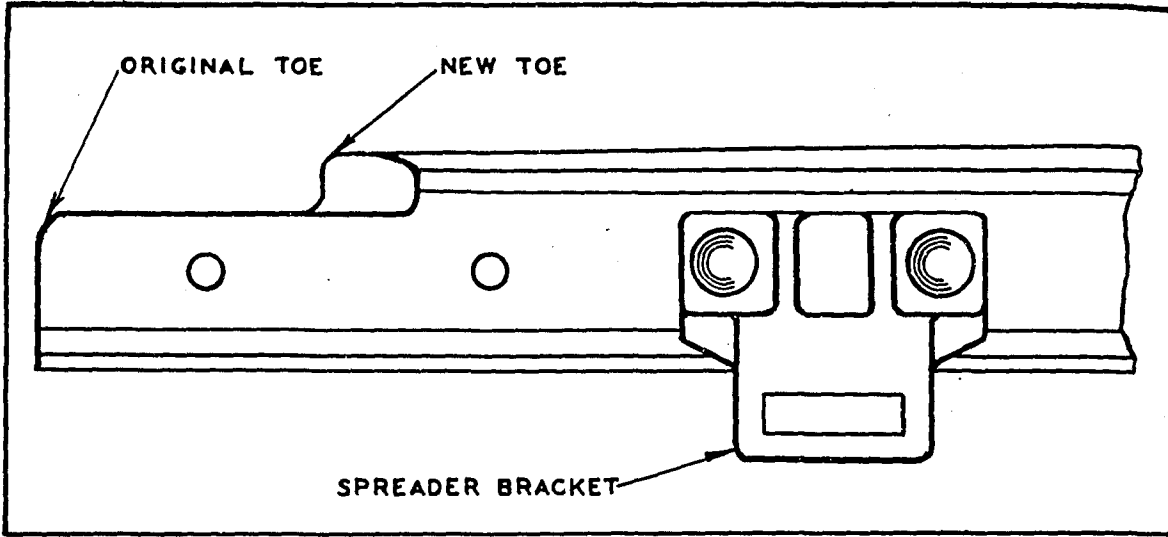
REMACHINING A CRUSHED SWITCH TO GIVE A NEW TOE
